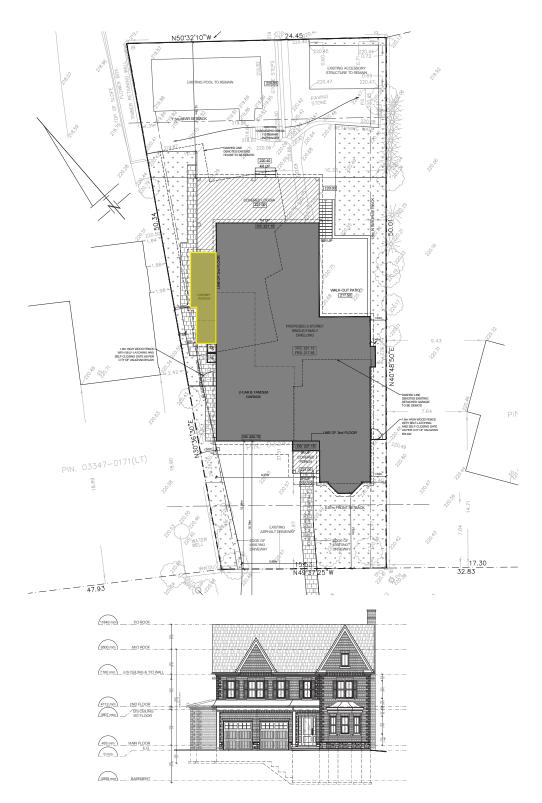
Site plan and elevation drawing showing the portion of 57 Napier Street that has been reduced to a single storey to transition the scale (Fausto Cortese Architects).
